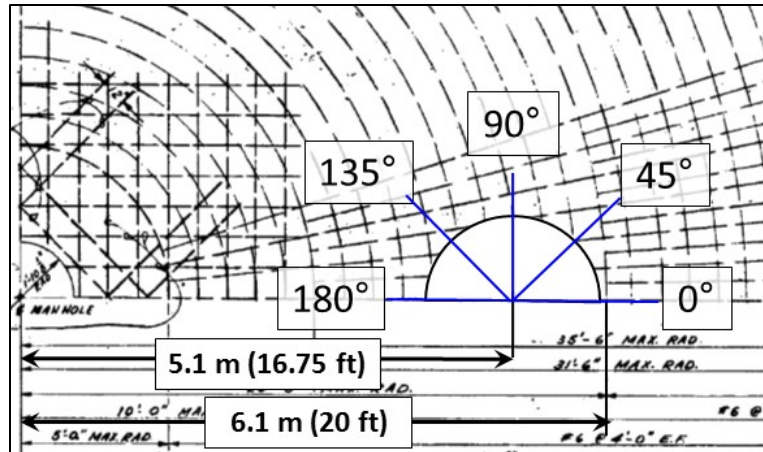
The 1.8 meter (6 foot) diameter penetration located in the design rebar pattern. Angles are shown where the local rebar and concrete stresses are evaluated.
